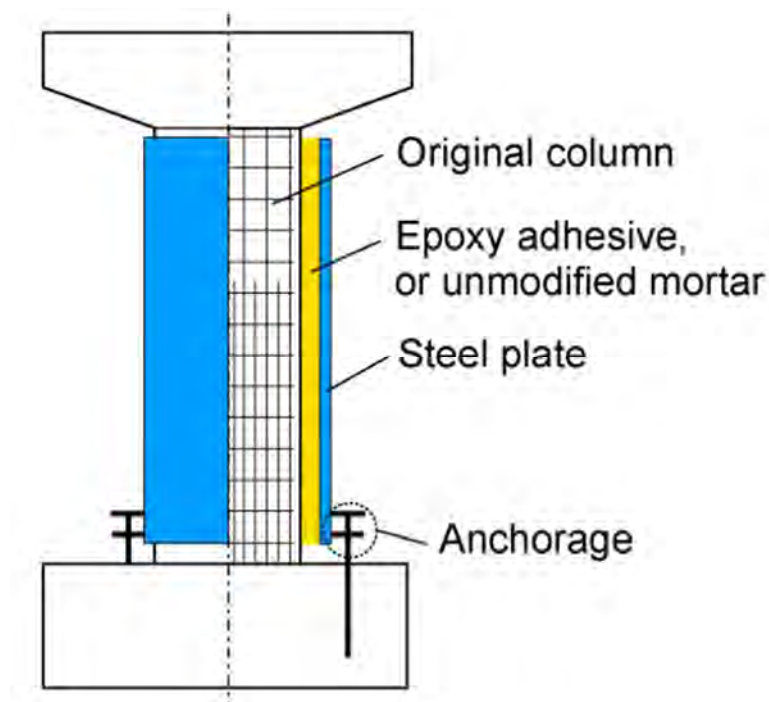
Steel jacketing of a RC column (Zhang et al., 2009)
